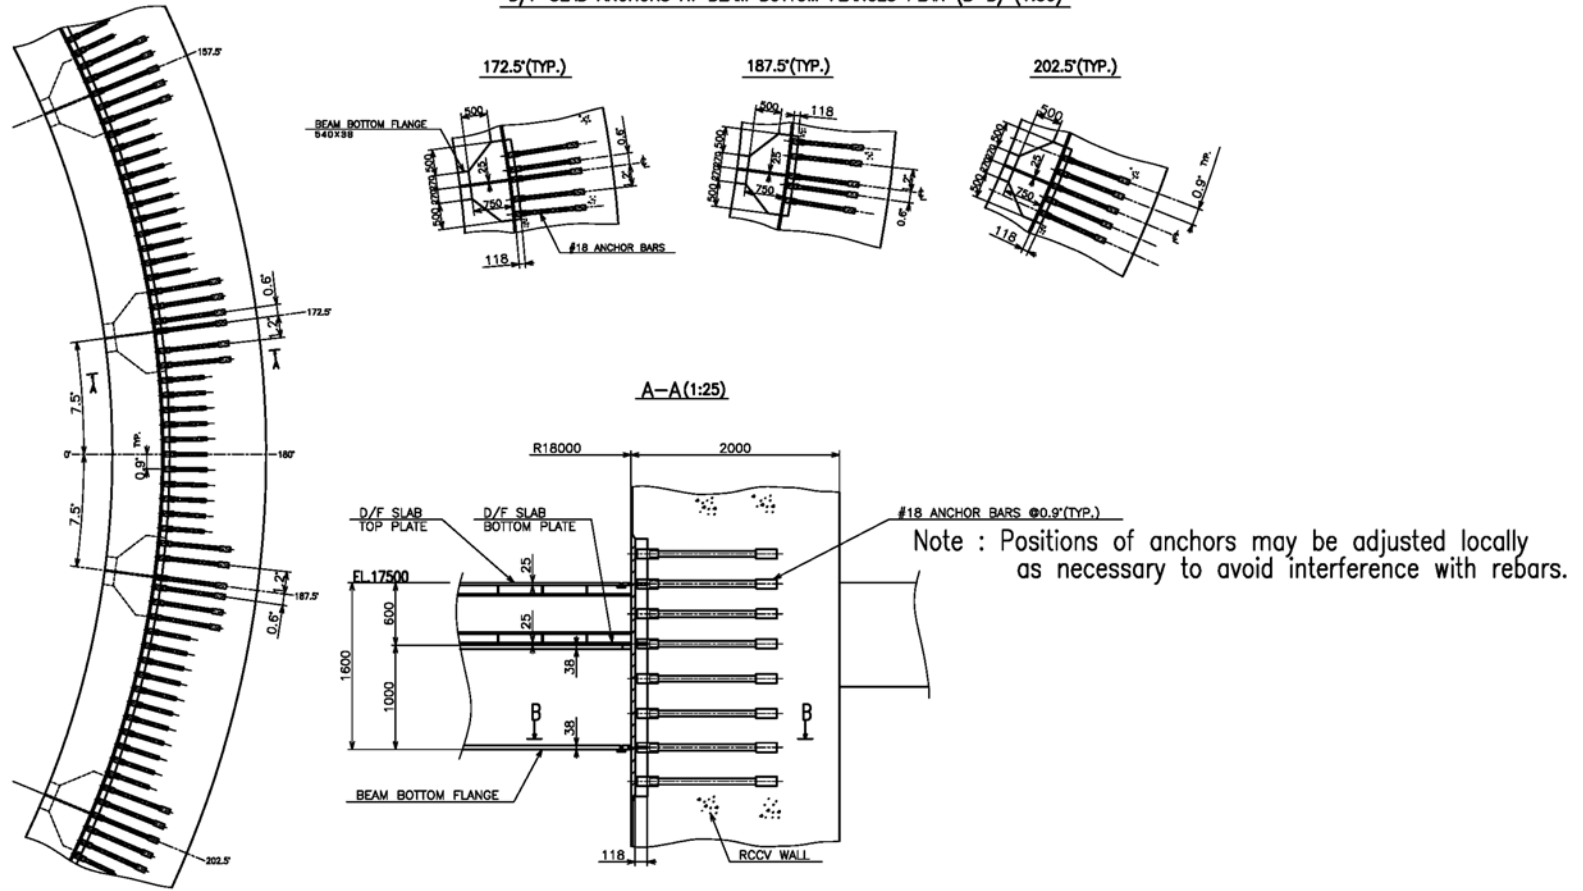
G.1-56. Diaphragm Floor Slab Anchor
